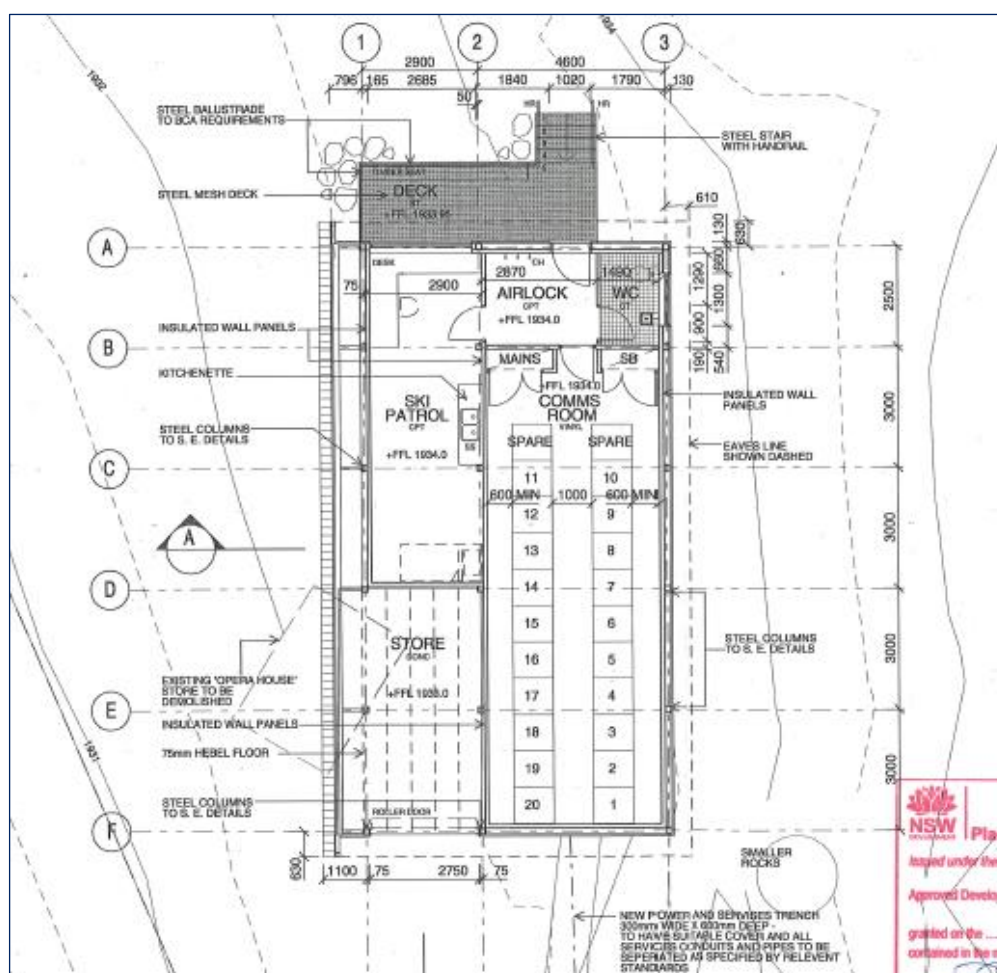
| Approved floor layout of development (Source: Applicant's original documentation)
